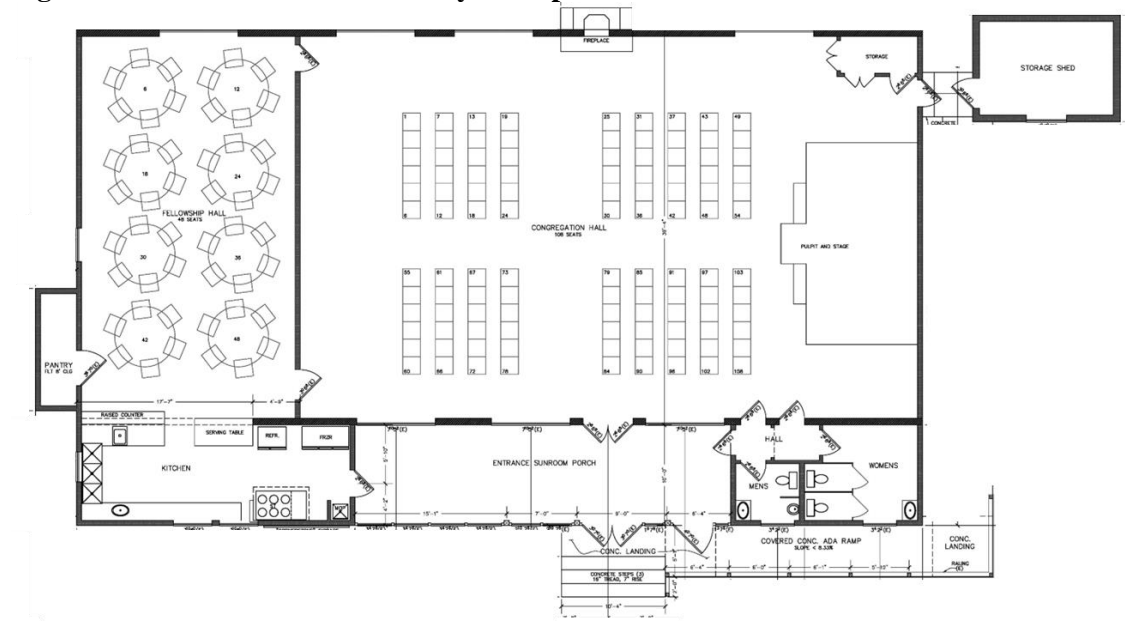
Cornerstone House of Prayer Proposed Floor Plan
